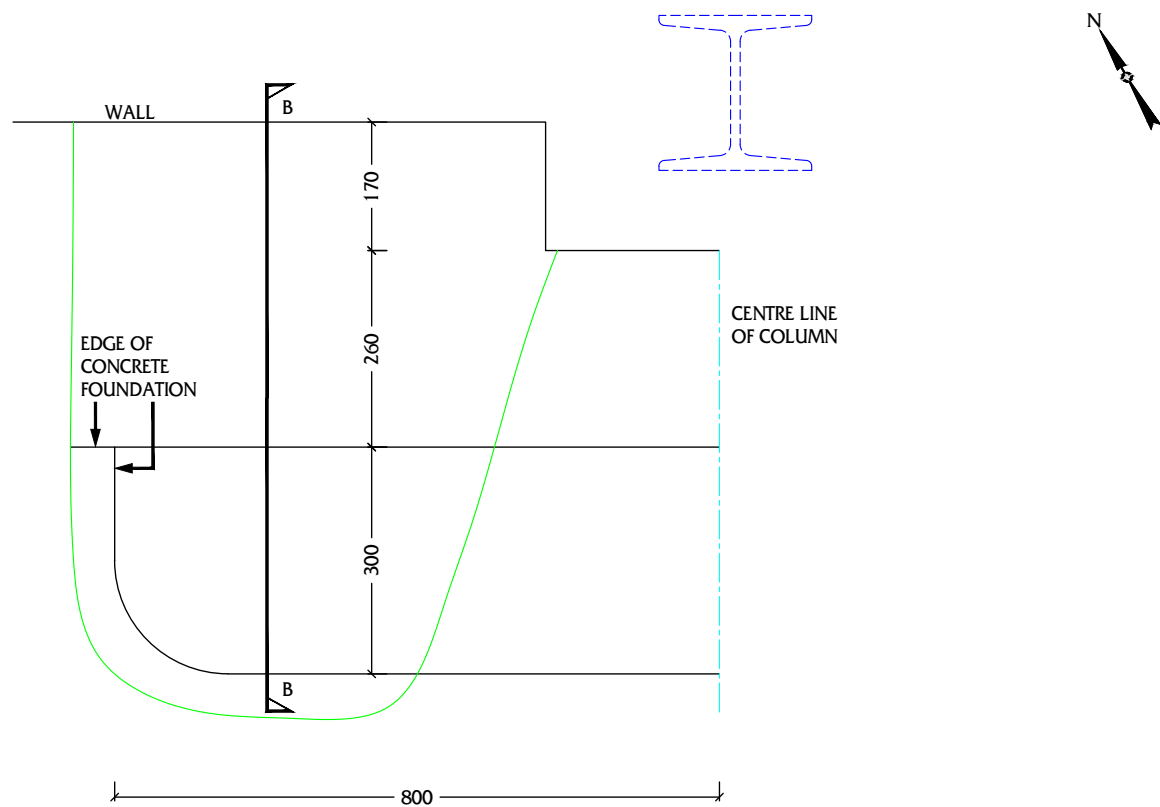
PART PLAN SHOWING DETAILS OF FOUNDATION AT TRIAL PIT TP2 SCALE 1:10
